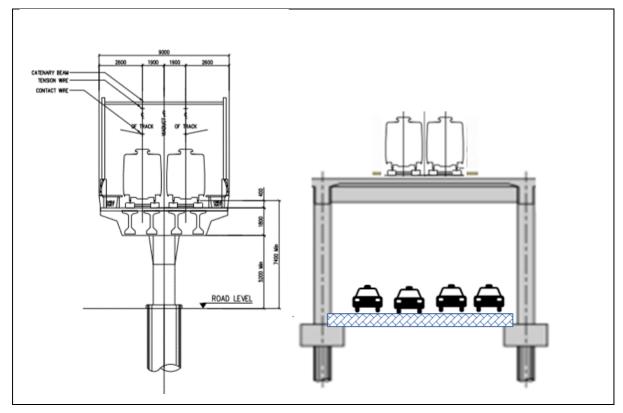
Single column pier (left) and rigid frame type pier (right).
